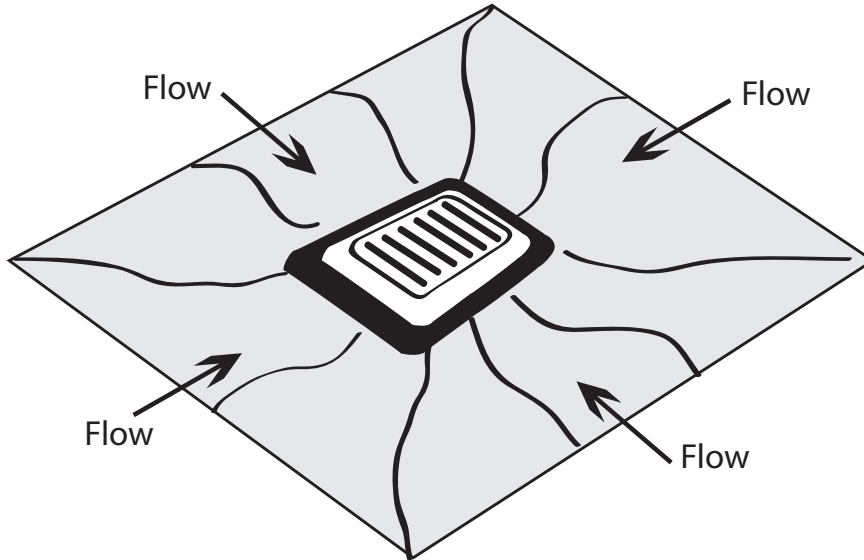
Perspective of Excavated Drop Inlet Protection
